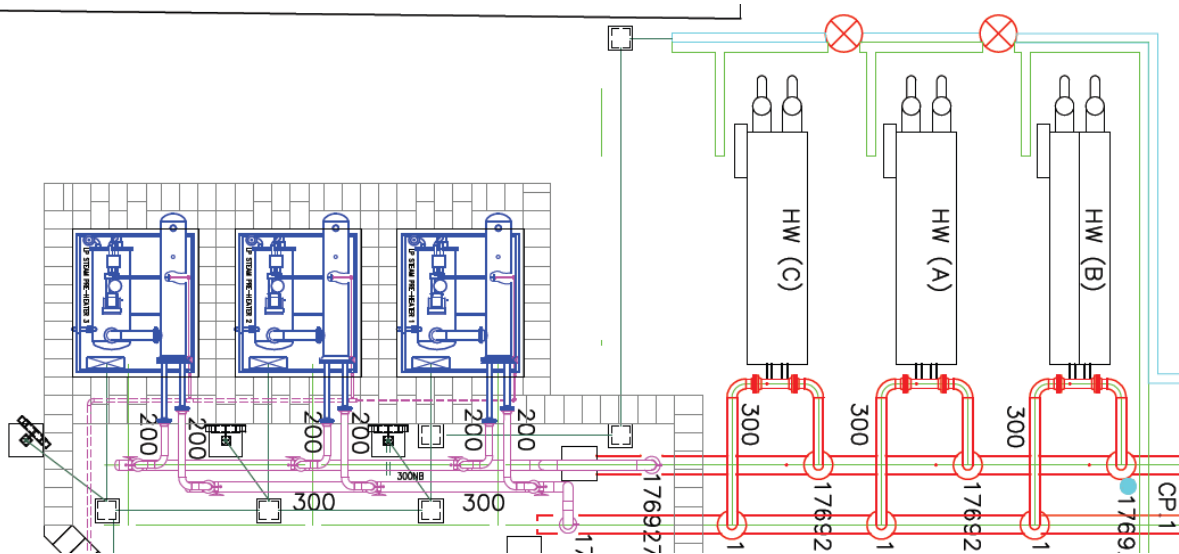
Proposed layout of large LP Steam units at Towton adjacent to the existing WBHs
